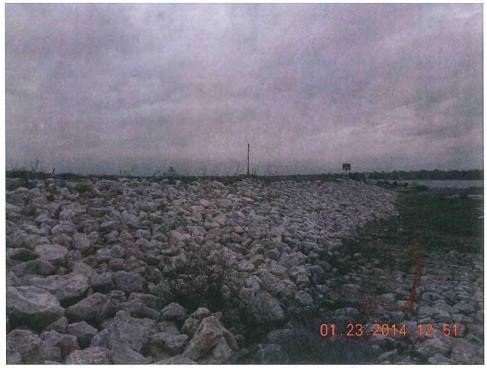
Post-enhancement slope of Area #4 on the eastern slope of the Central Berm.
